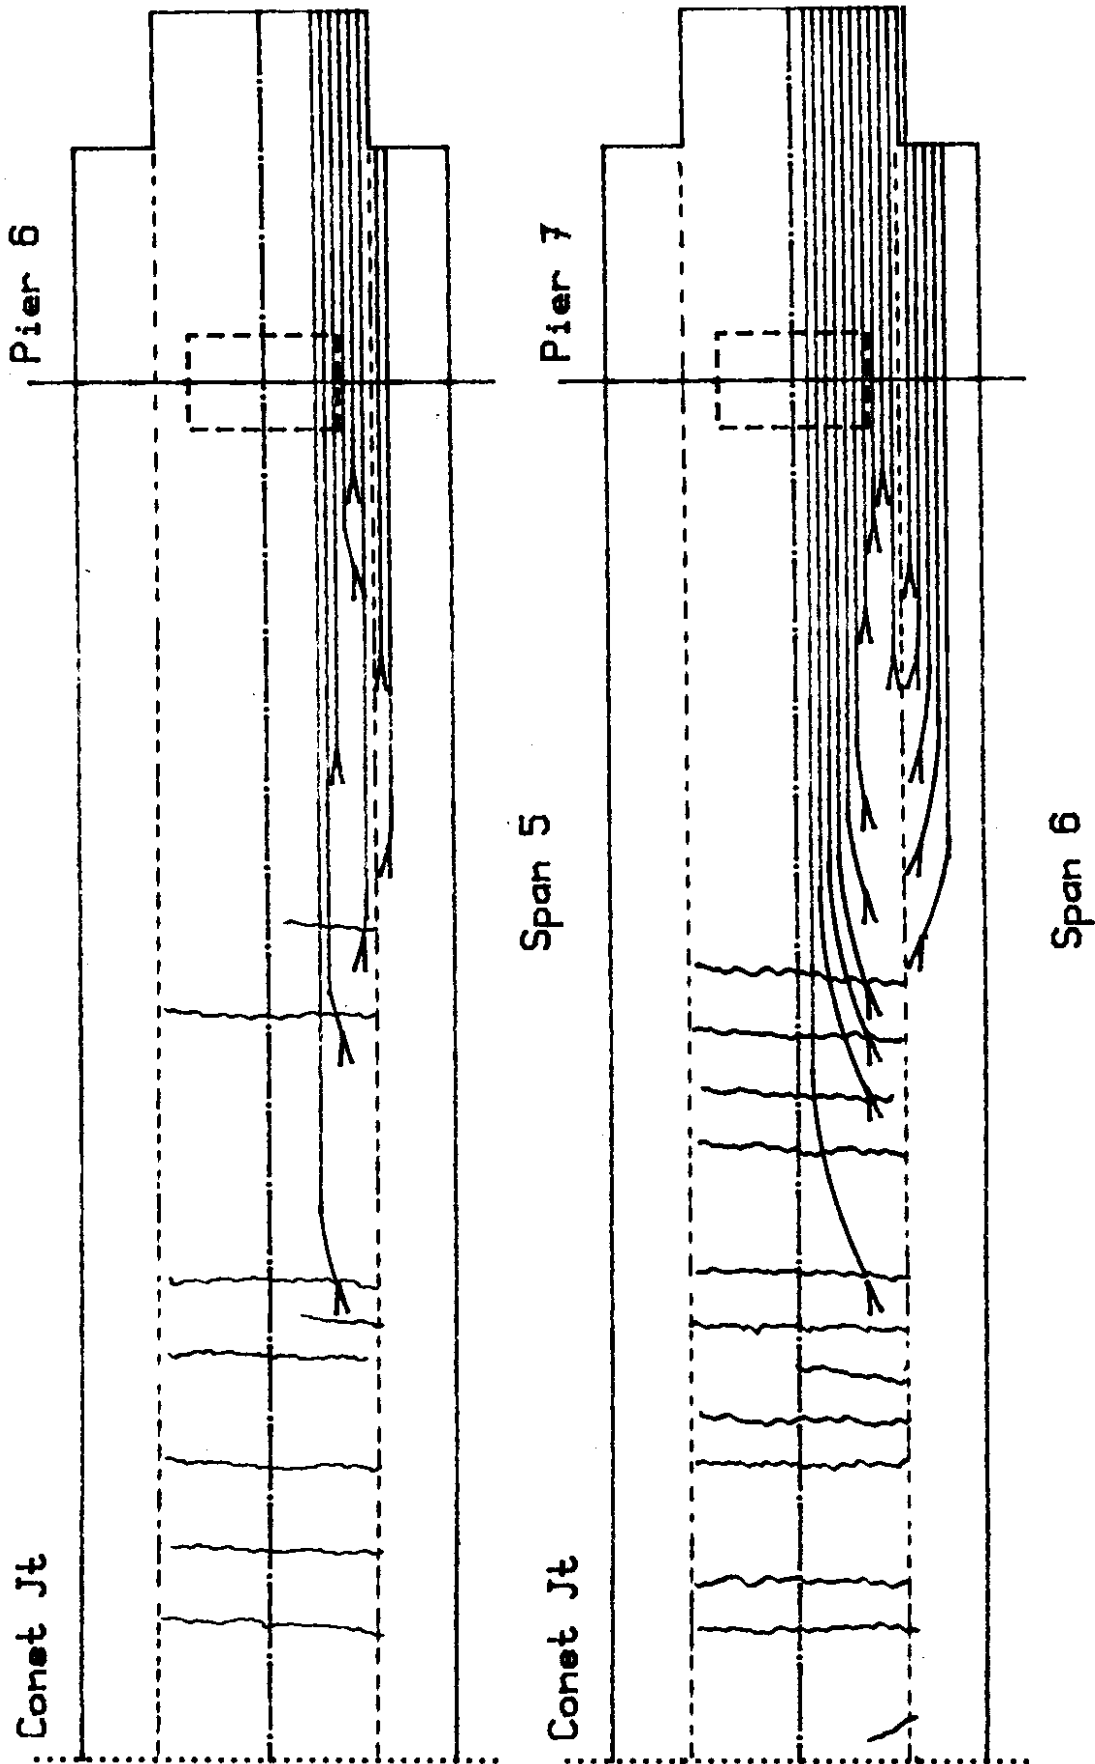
Stage II cracking and Stage II and III prestress tendons, Spans 5 and 6
